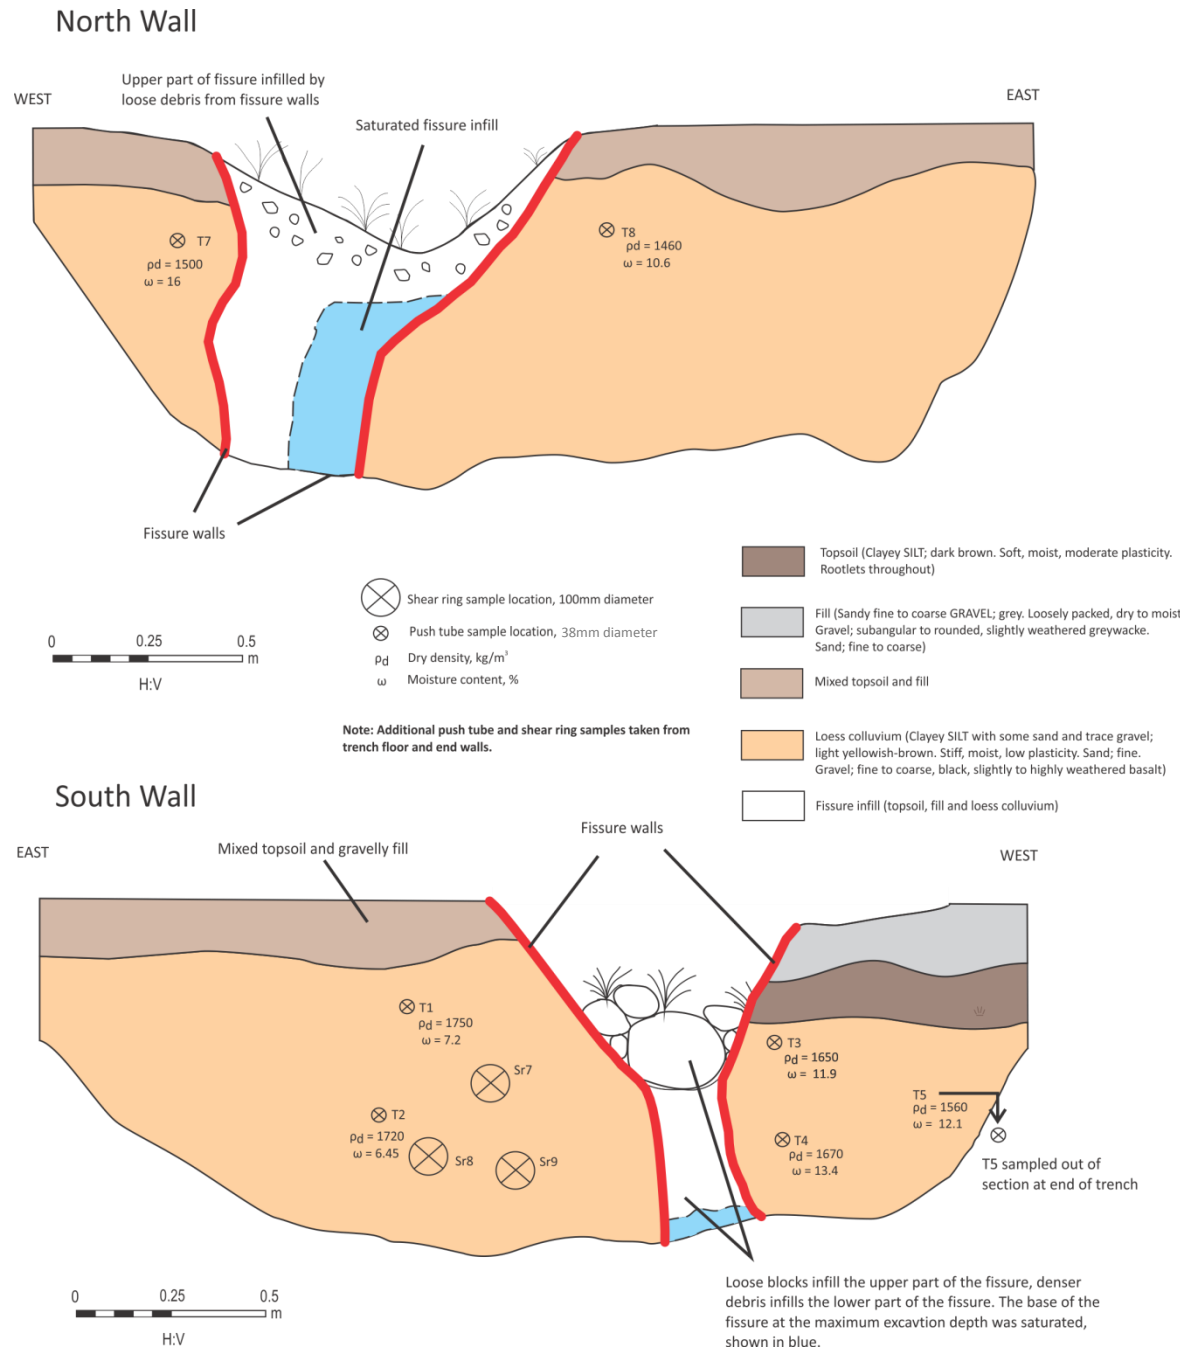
Trench logs. Trench was located on flat ground. Uphill direction is east, downhill direction is west. Additional out-of-section push tube samples not shown.
